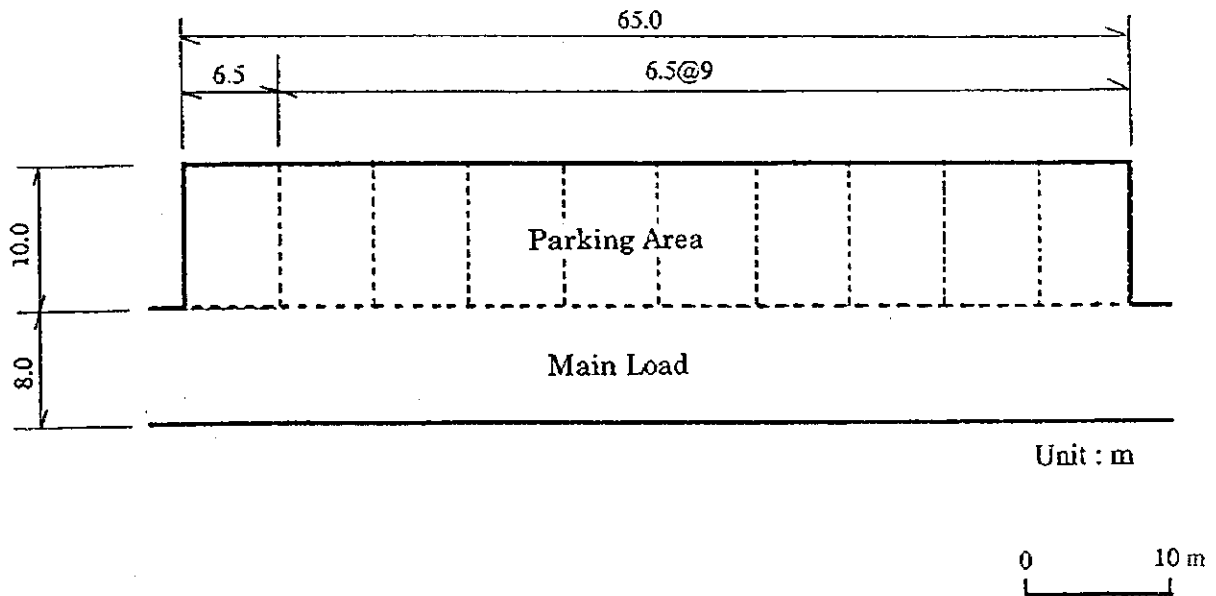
layout Plan for Allotment of Boat Trailers
